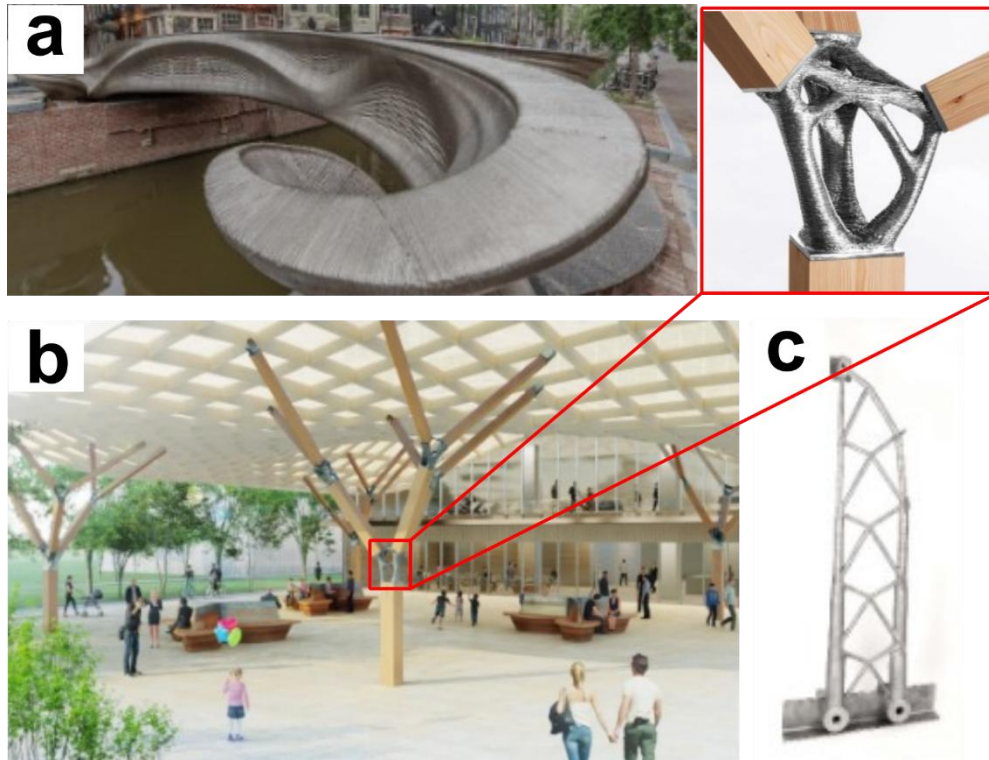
WAAM construction applications, a). Amsterdam bridge [9], b). structural steel connector [143], c). Truss [144].
